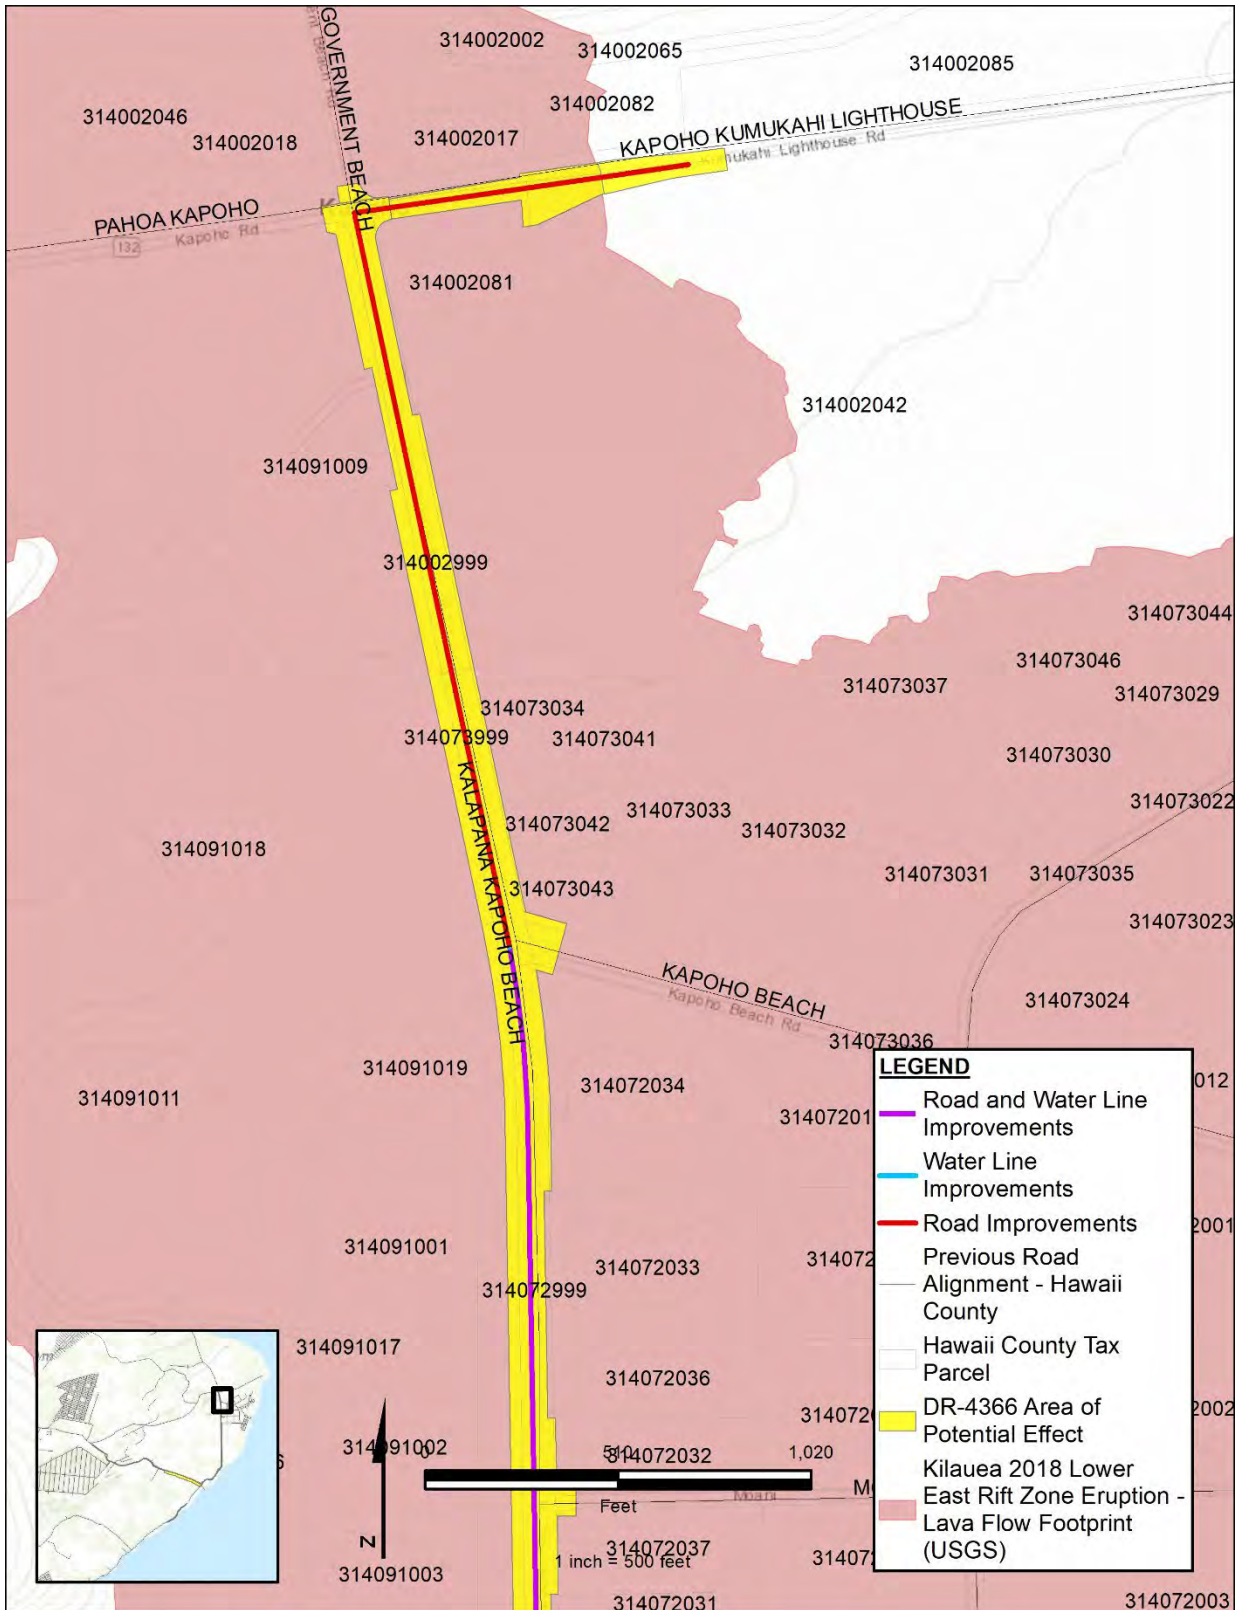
Location of proposed road alignment for Kumukahi/Lighthouse Road
